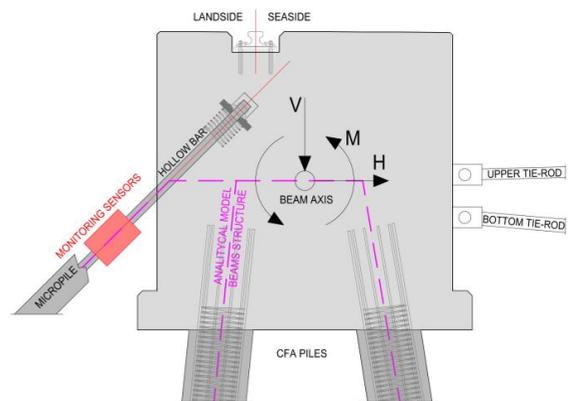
Cross-section of the RCB with monitoring sensors highlighted in red
